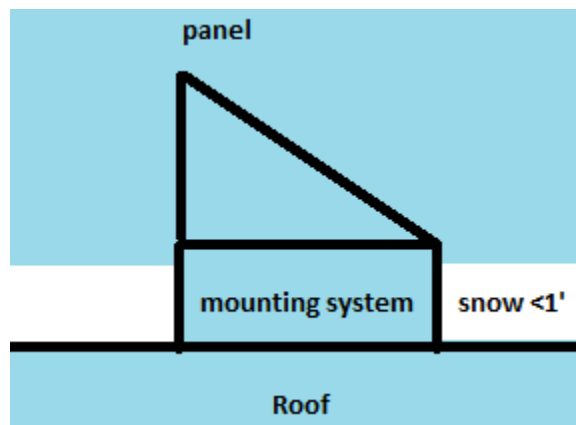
Side View of Solar Panel with Snow Below Clearance level
